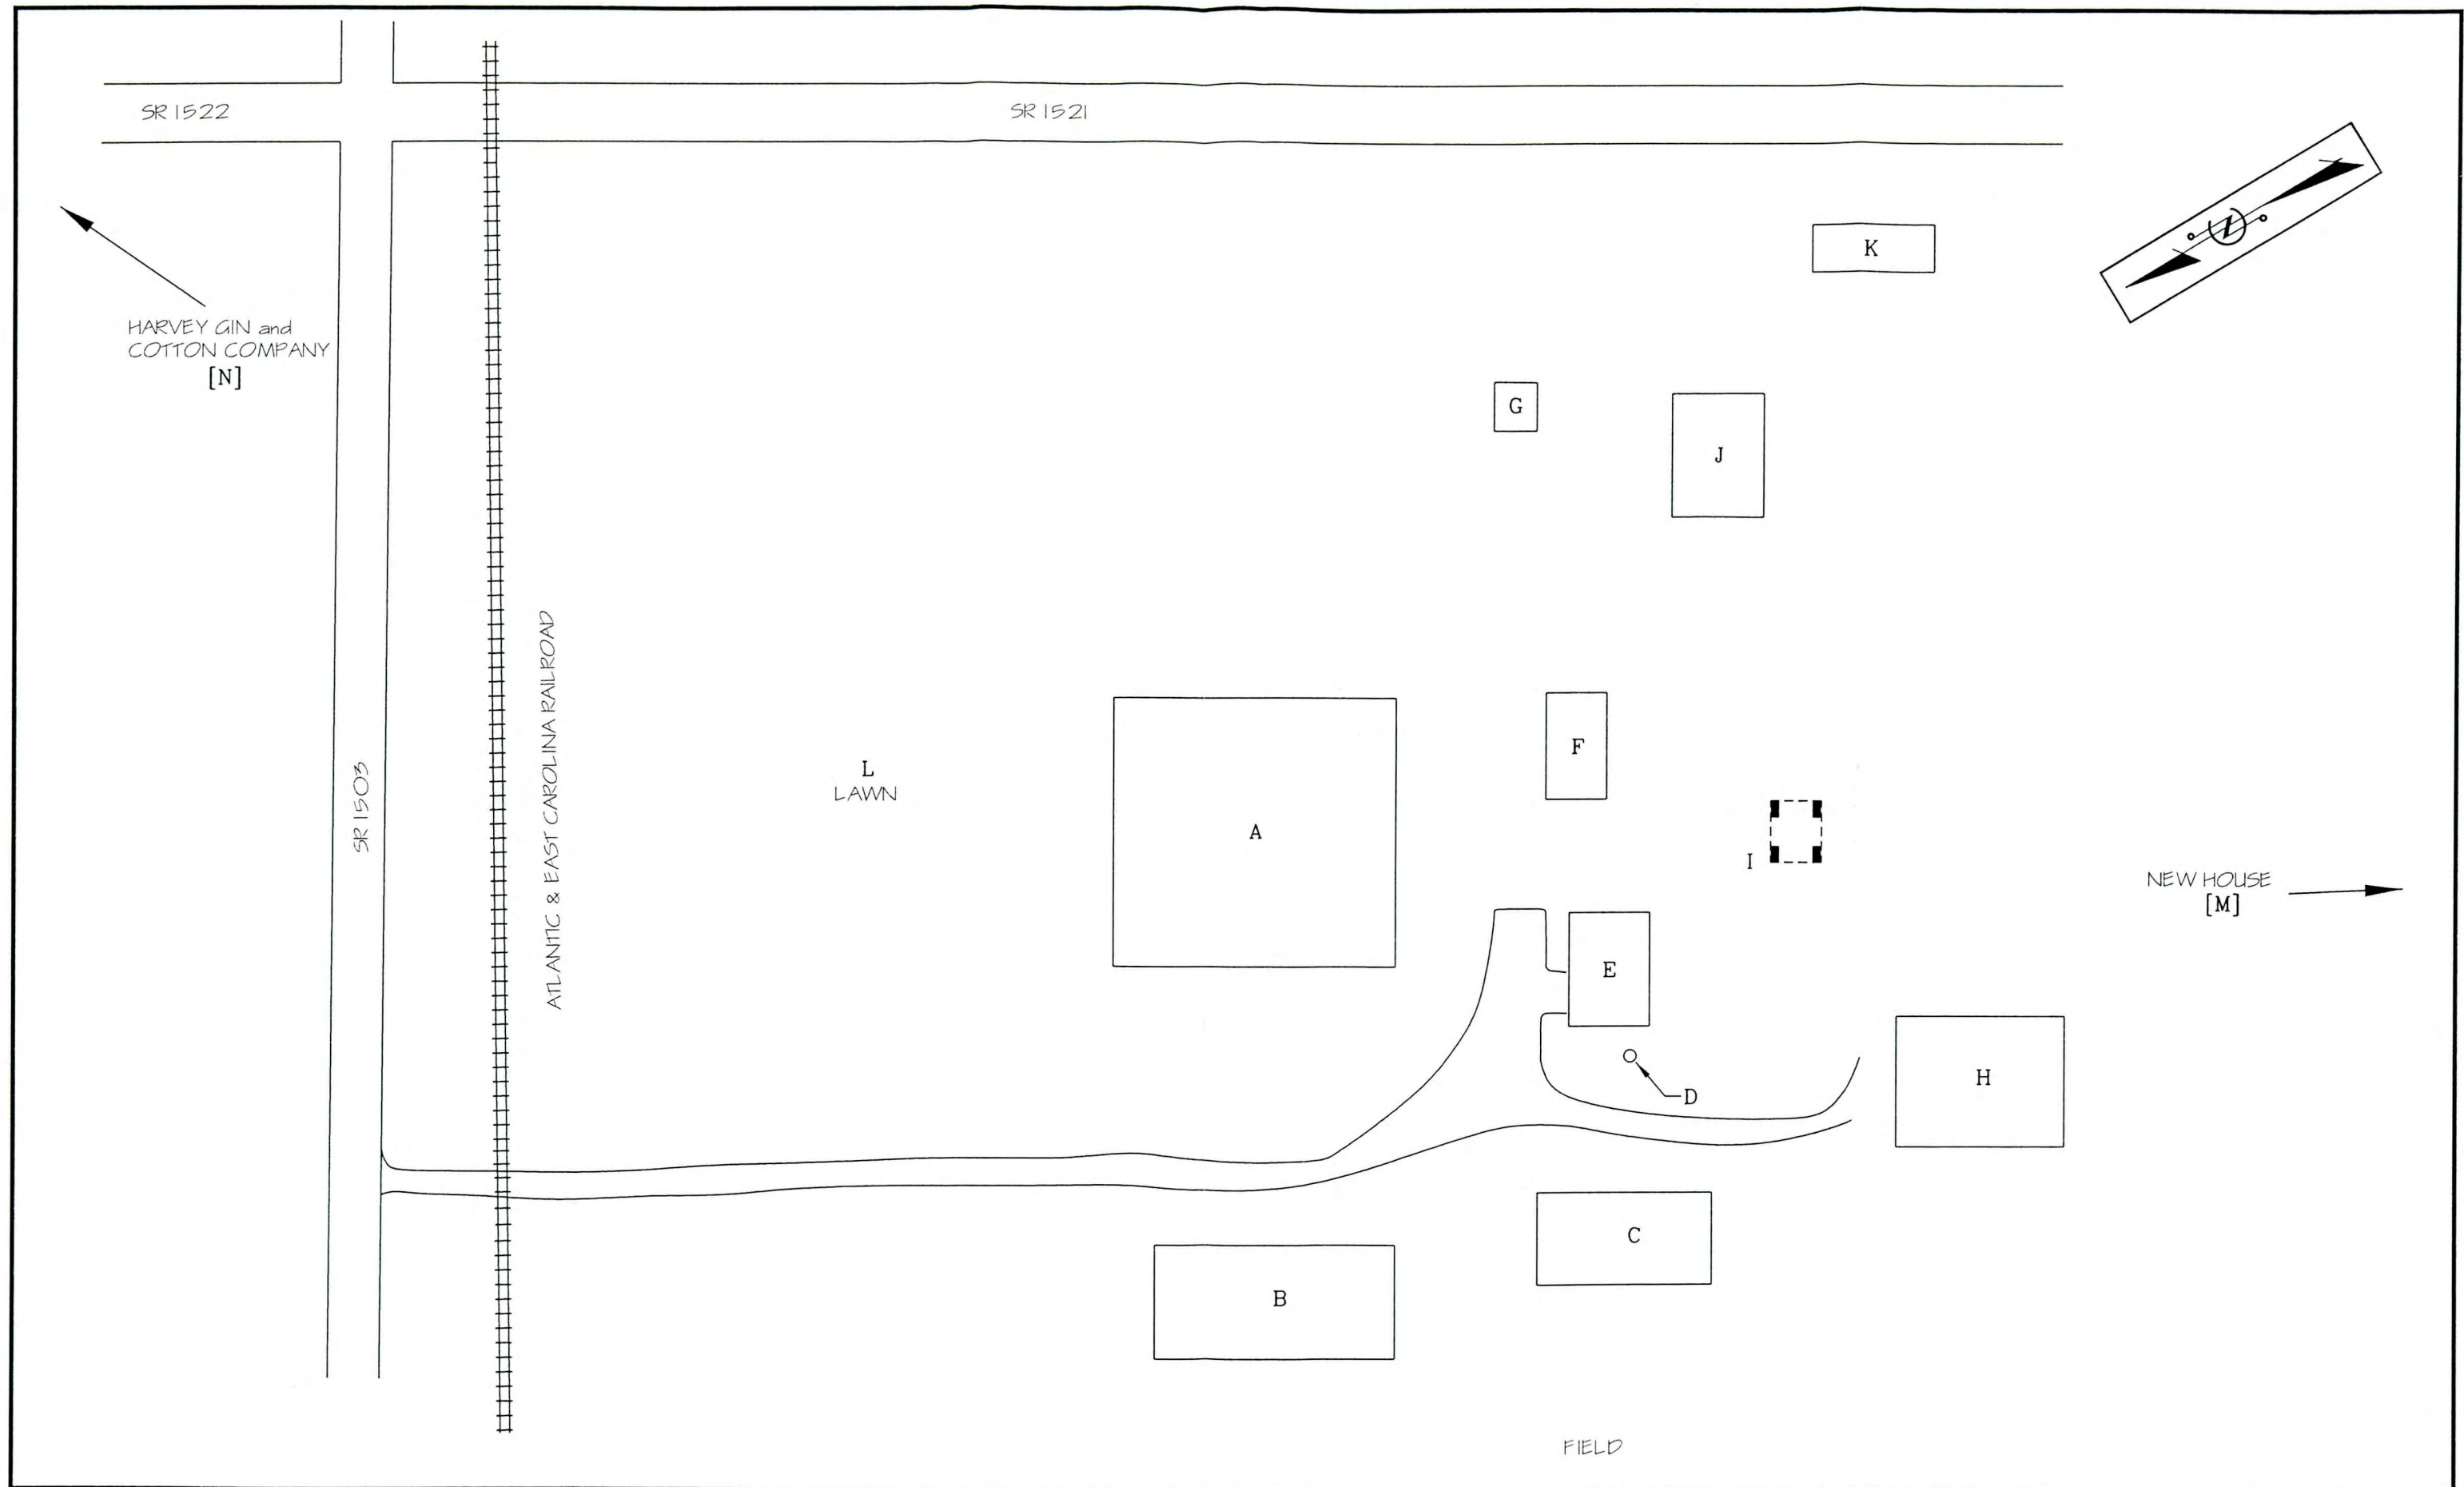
Fields-Sugg House (#9) - Site Plan, Based on Jones, Depicting Location of House and Associated Resources
